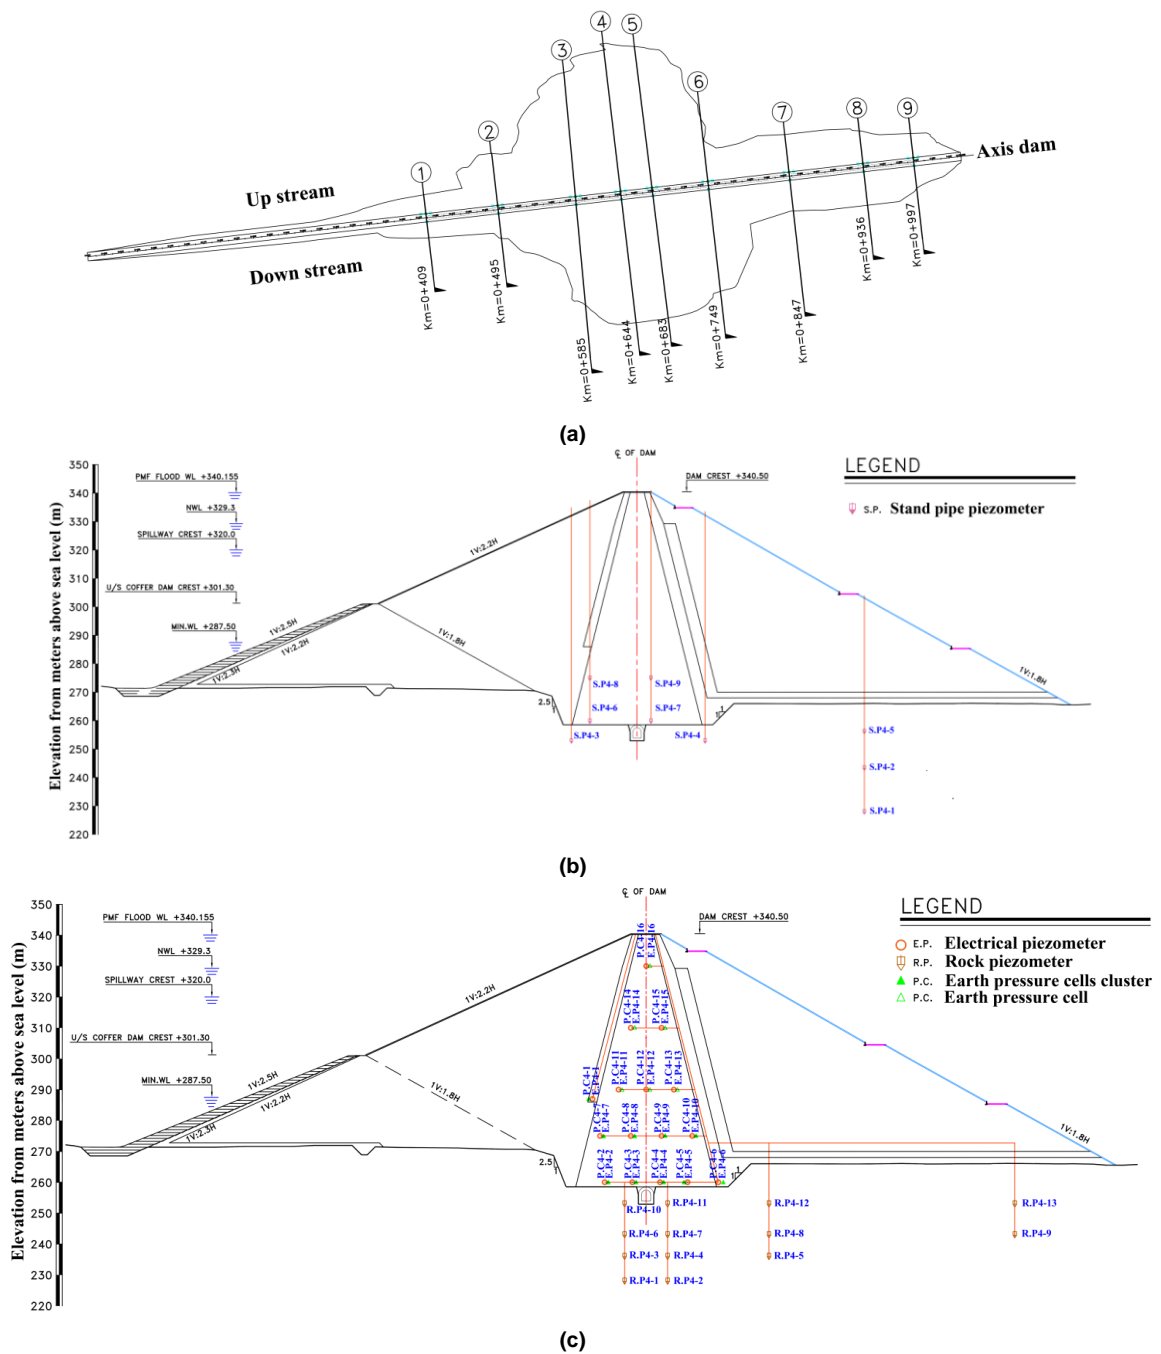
Locations of instrumentation at Balaroud dam: (a) Nine instrumentation sections, (b) Standpipe piezometers in section 4, (c) Embankment, rock piezometers and total pressure cells, in section 4.
